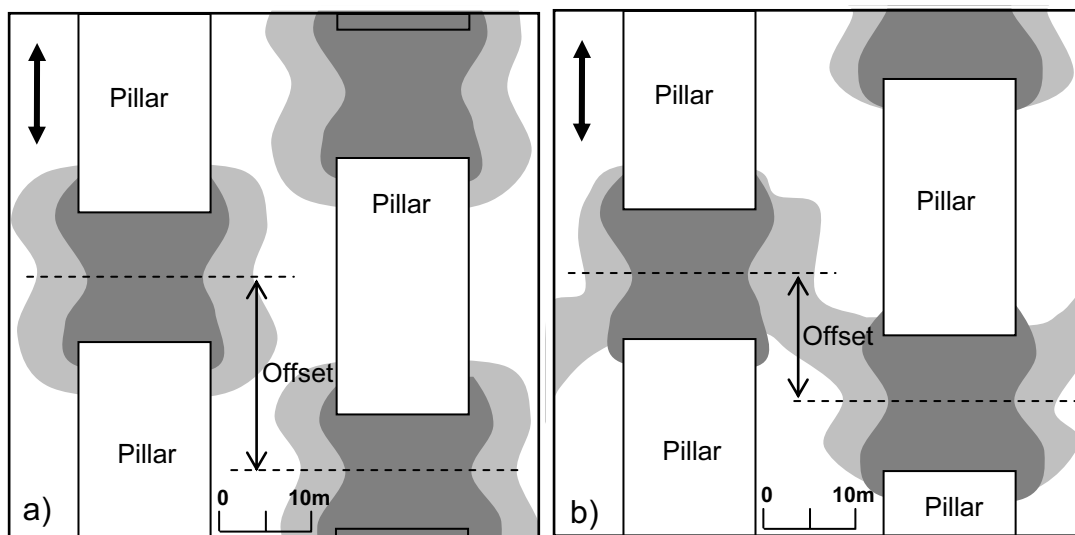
Plan view showing effect of a change in the pillar offset on potential roof failure in a room and pillar layout consisting of rectangular pillars. Darker shading indicates initial failure and lighter shading indicates potential failure growth. The arrow indicates the direction of maximum horizontal stress.
